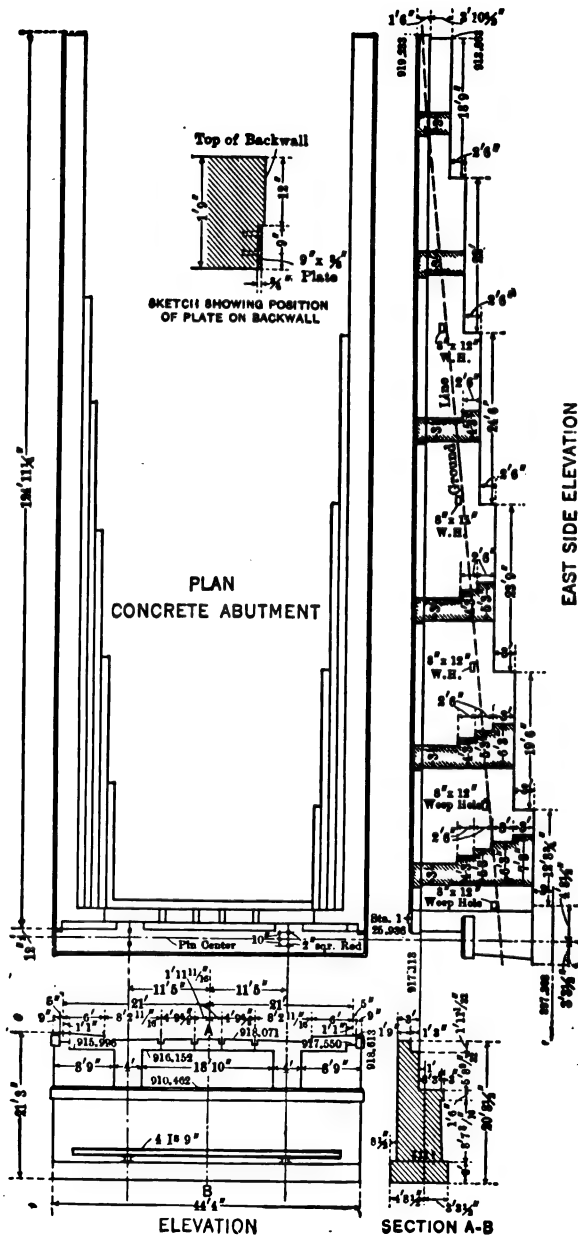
KNOXVILLE ANCHORAGE, U ABUTMENTS.
